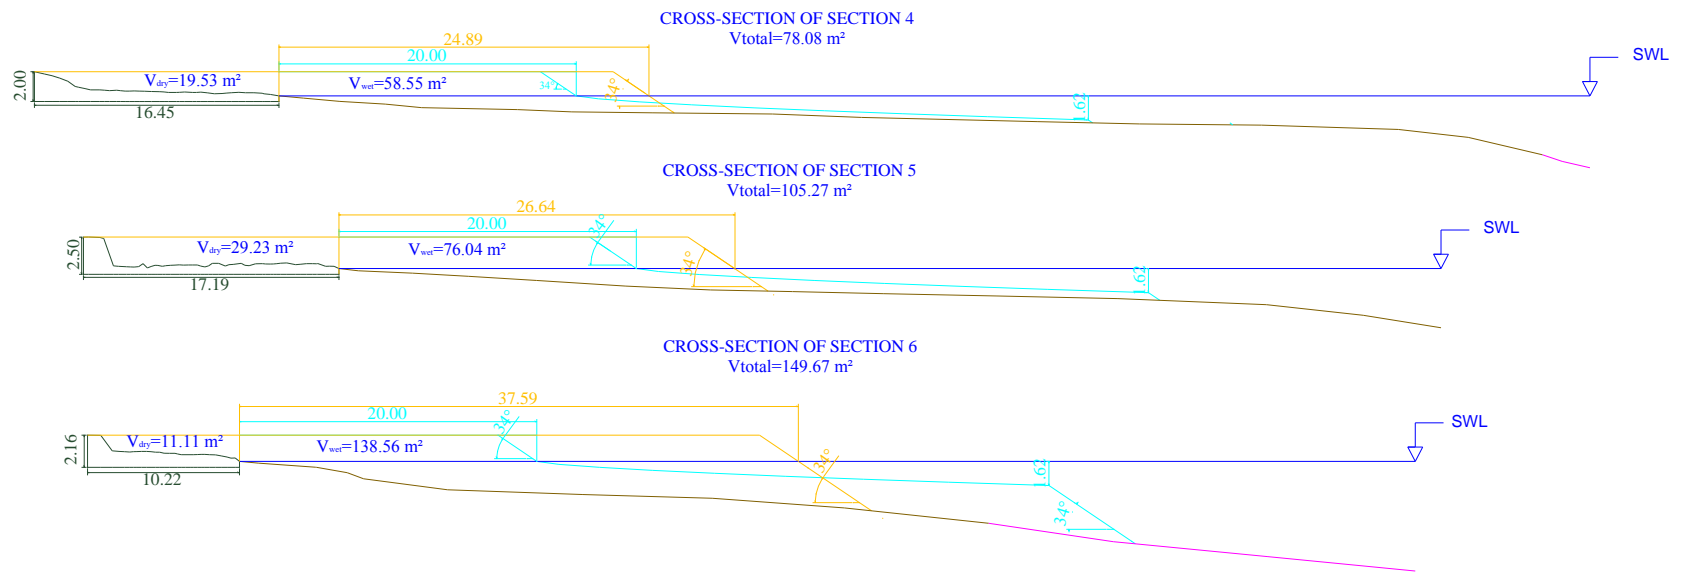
Design profiles of Section 4,5 and 6 for 20 m new dry beach width ($D_{fill}=0.45$ mm).
